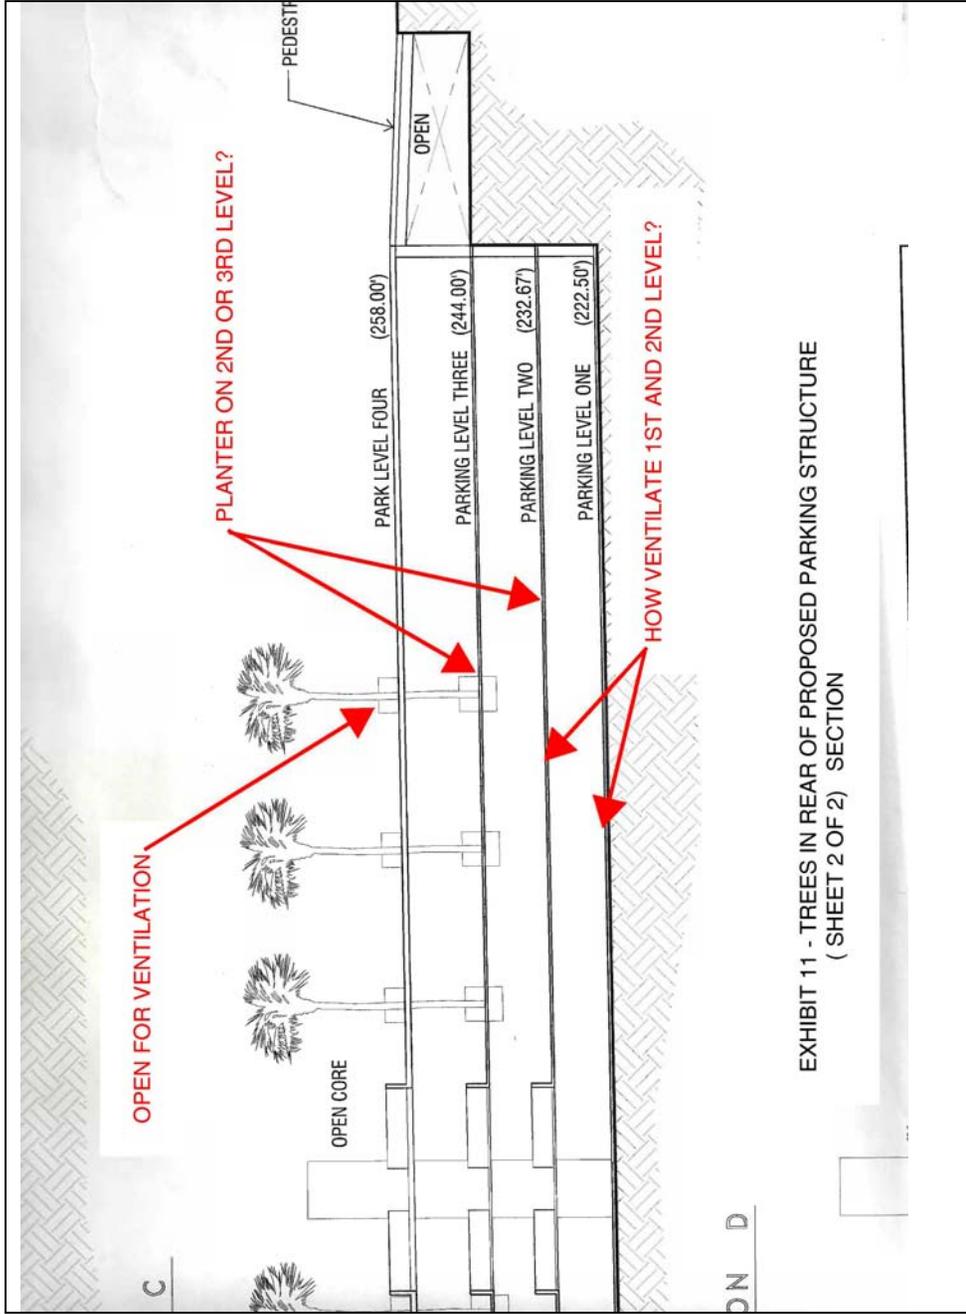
TREES IN REAR OF PROPOSED PARKING STRUCTURE
